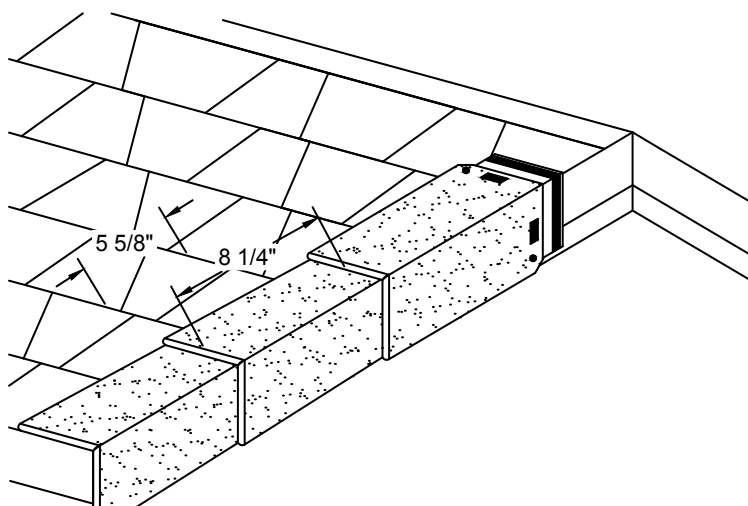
Installation of EZ-Ridge™ Shingles on Rake Edges of the Roof
